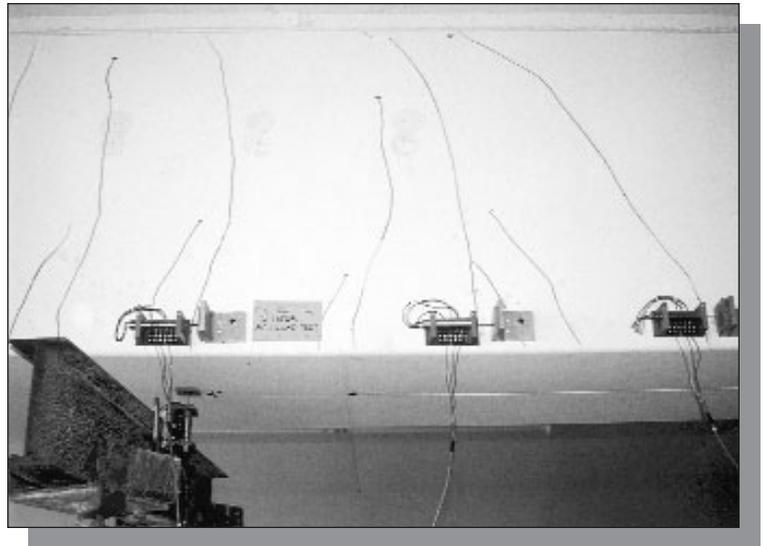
Mid-span of post-tensioned beam with cracking outlined. LVDT's are in place to monitor crack widths during load test.
